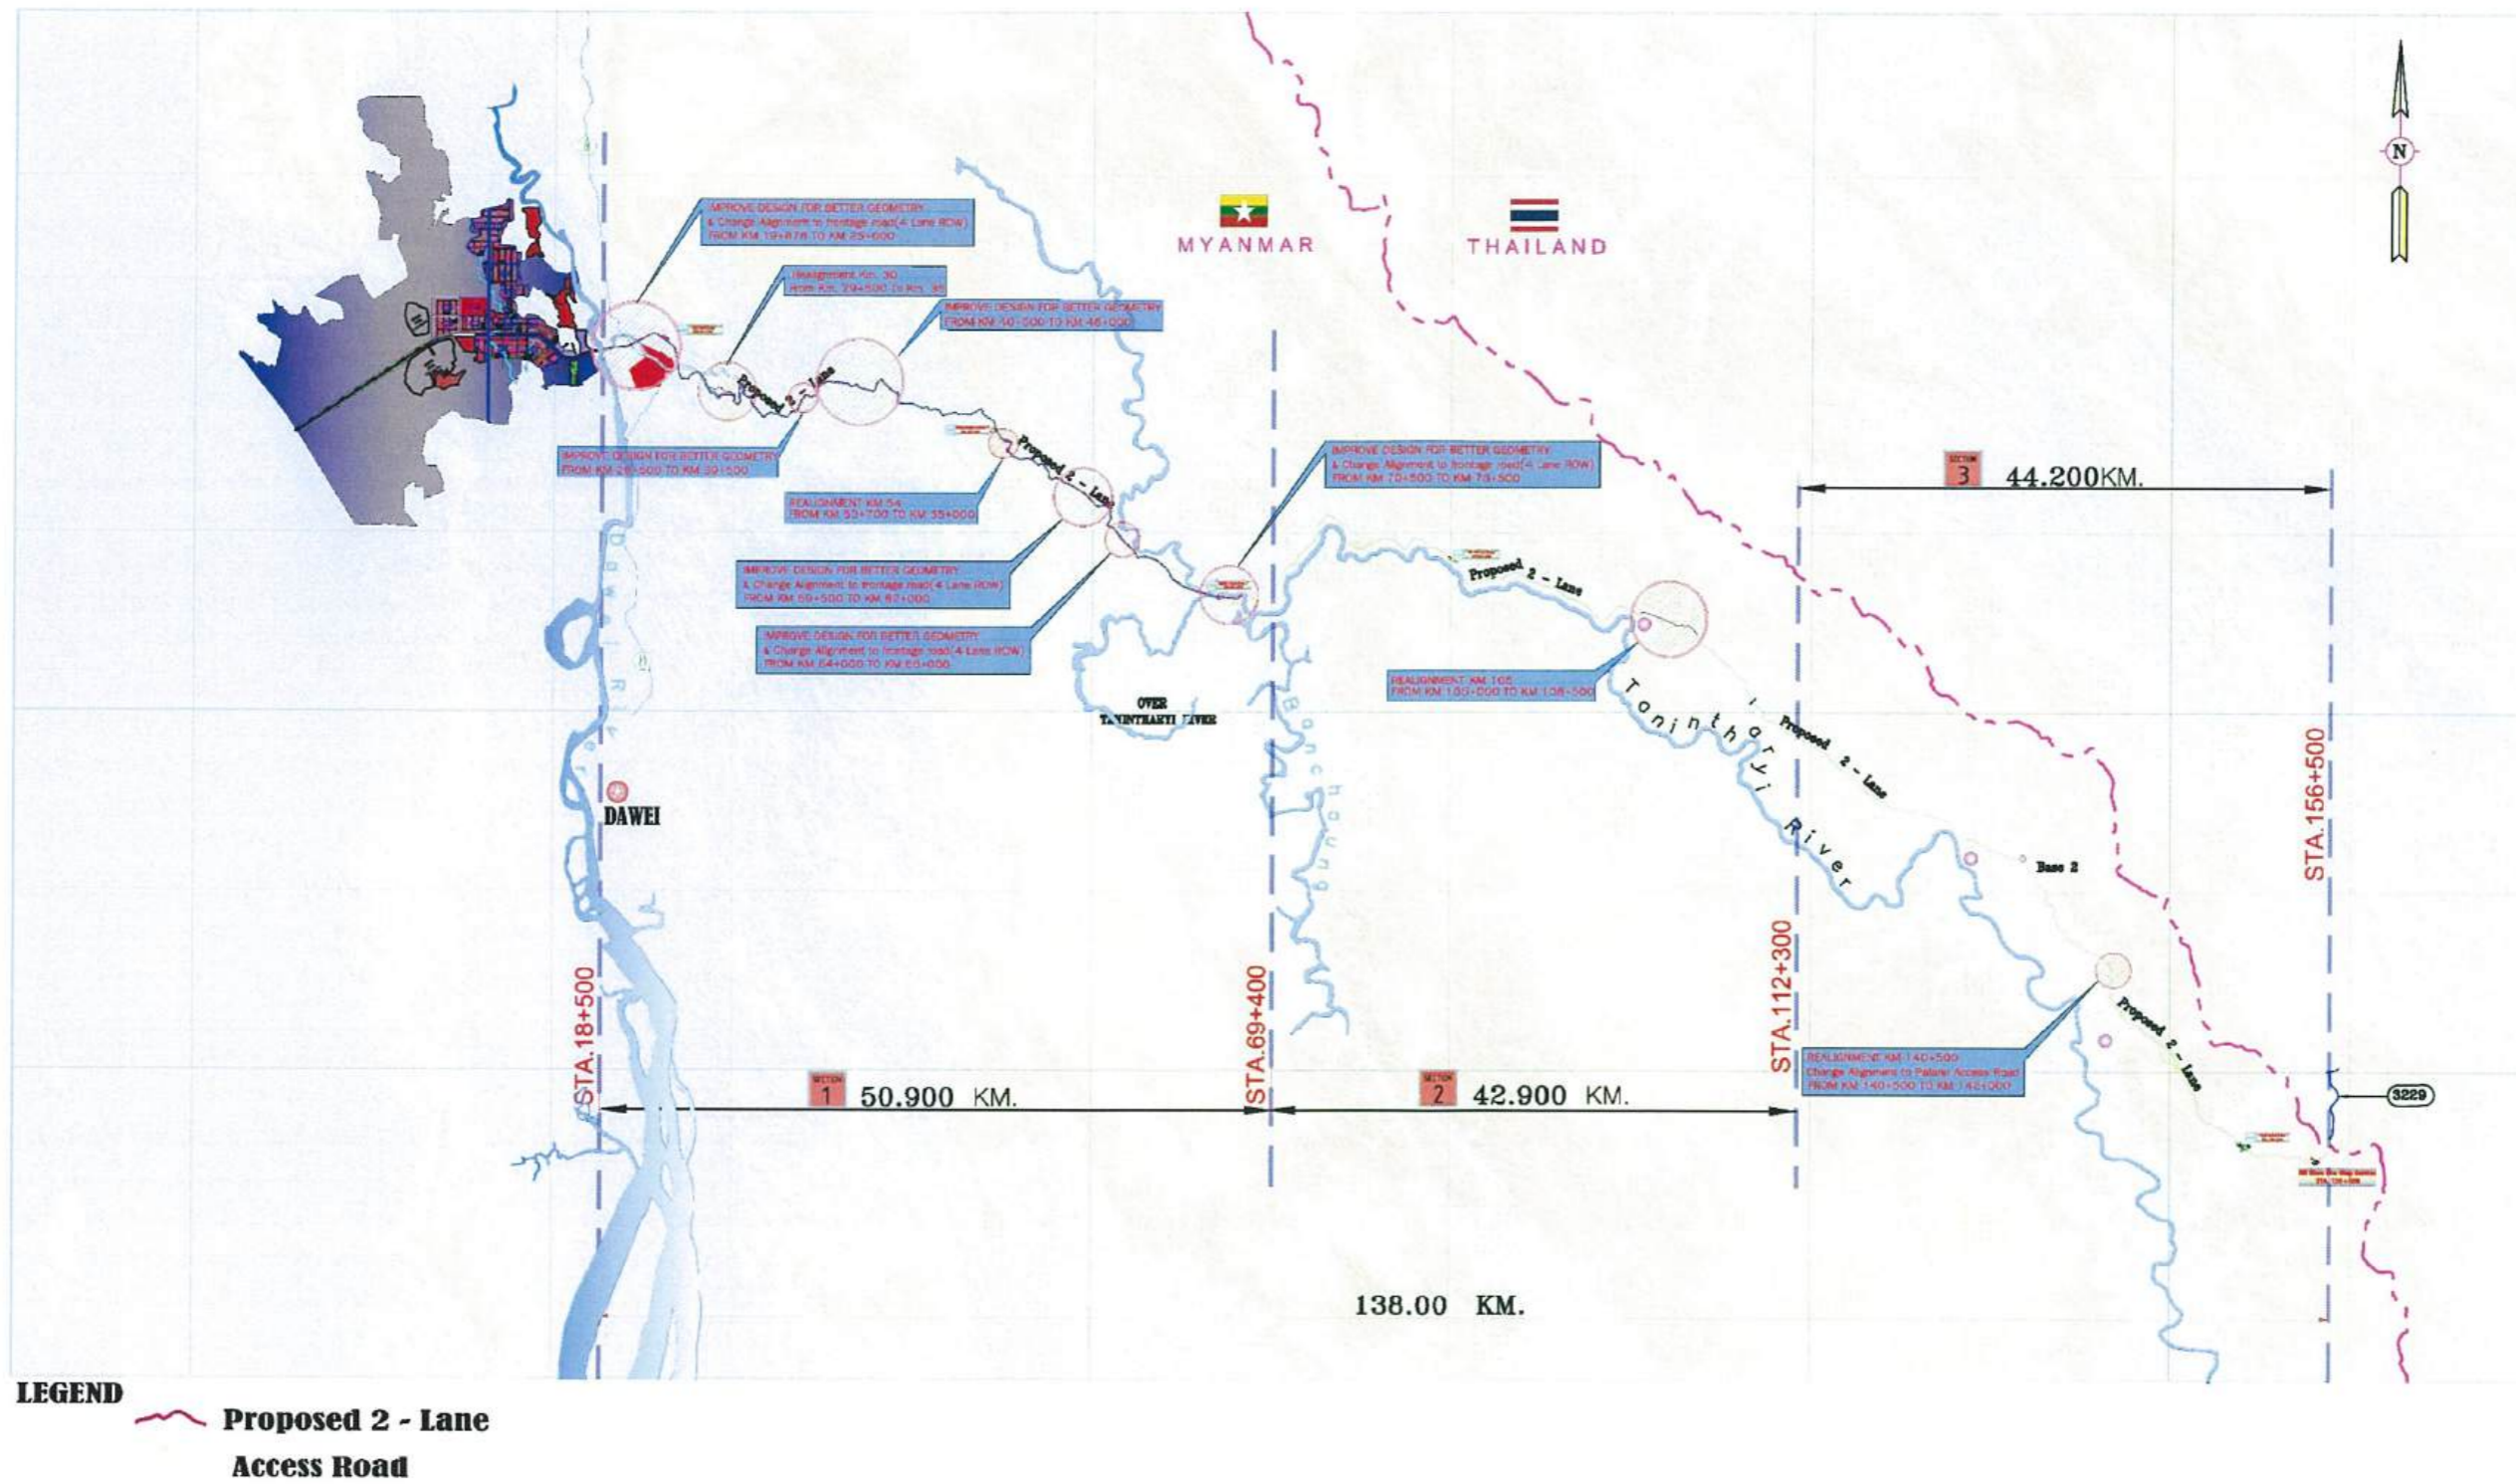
DEVIATED ALIGNMENT FROM EXISTING ACCESS ROAD OF TWO LANE ROAD PROJECT
